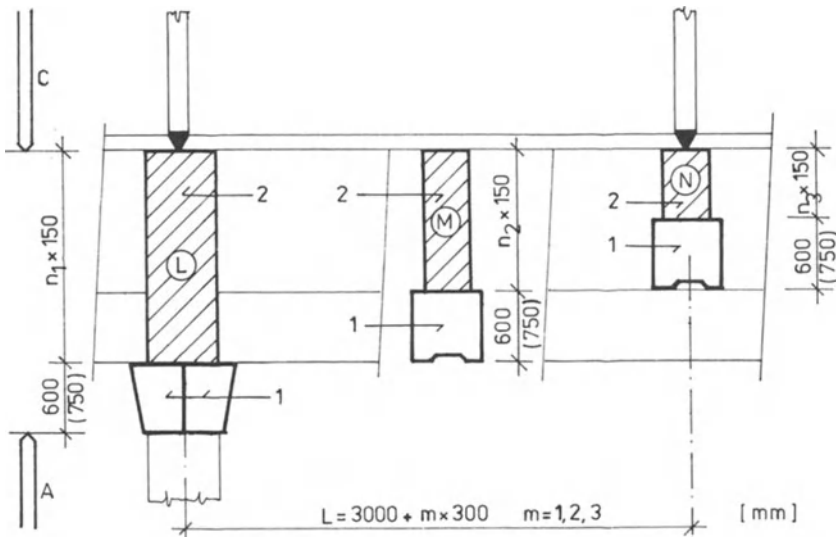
Orthogonal load-bearing system of the transition support structure (L) main beam; (M) secondary beam; (N) supplementary beam; (1) precast portion of cross section; (2) cast-in-place portion of cross section
